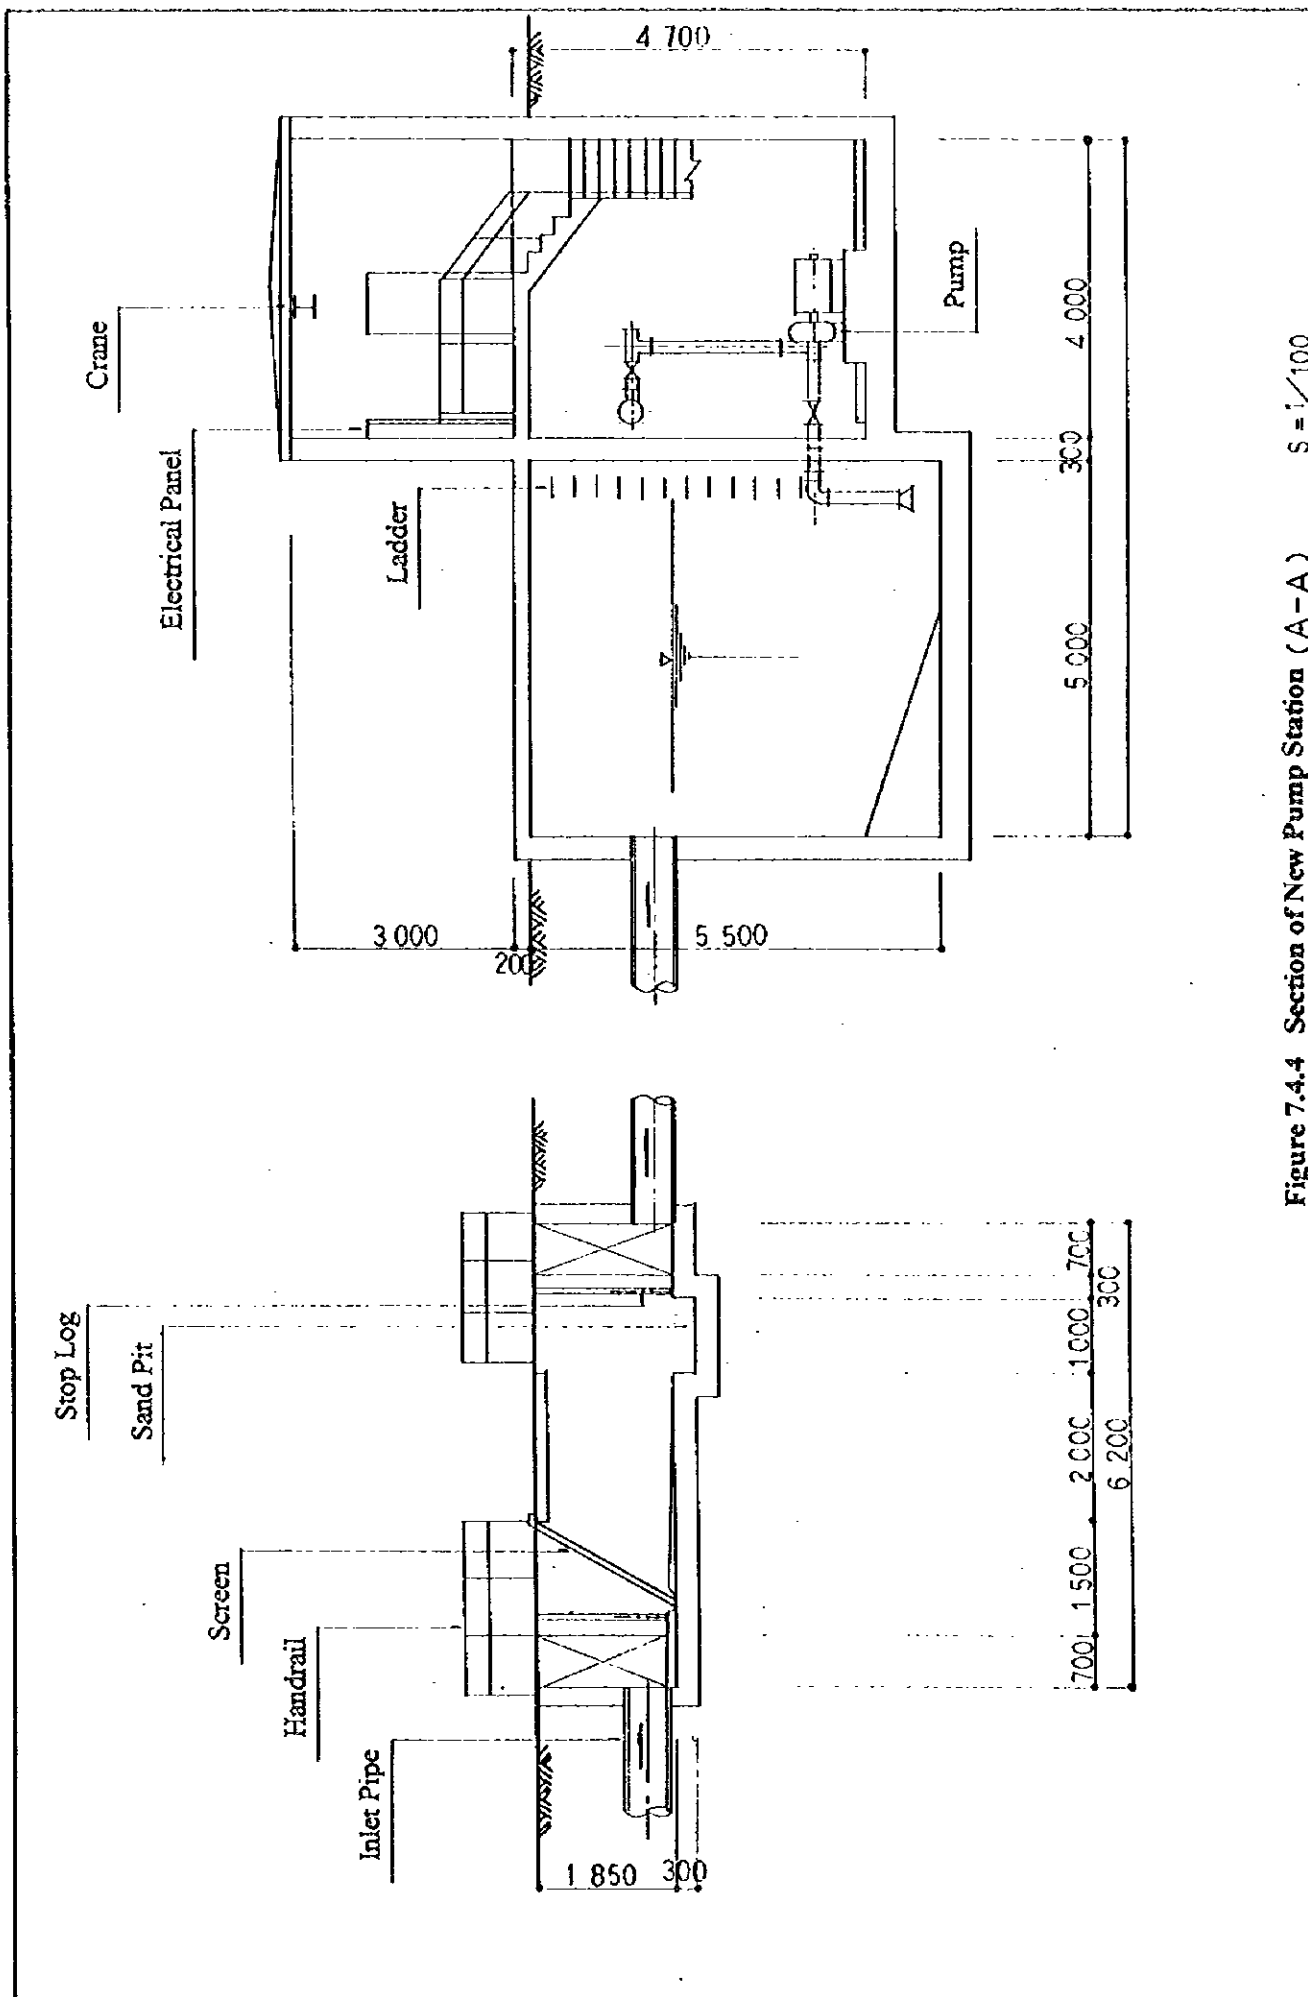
Section of New Pump Station (A-A) S = 1/100
